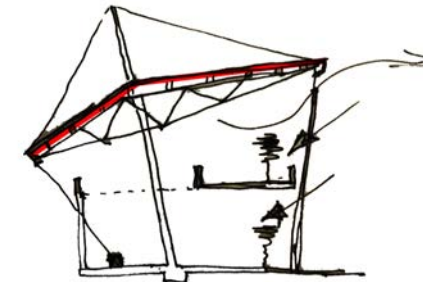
Greenhouse section sketch 7 (Author 2018)
